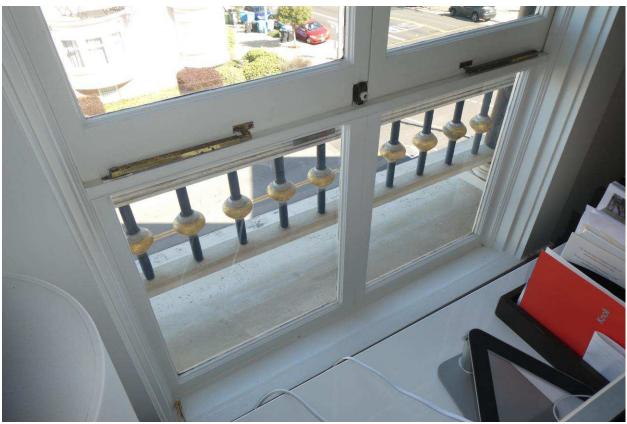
Interior detail of the attic window at the Waller Street gable end, lower fixed sash.
